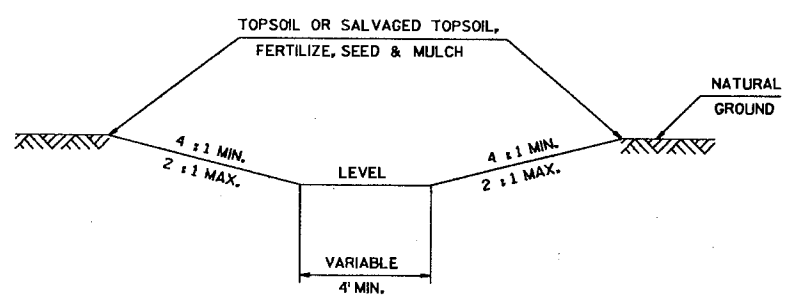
DETAIL FOR CROSS - DRAINS AT THE FOLLOWING STATIONS
